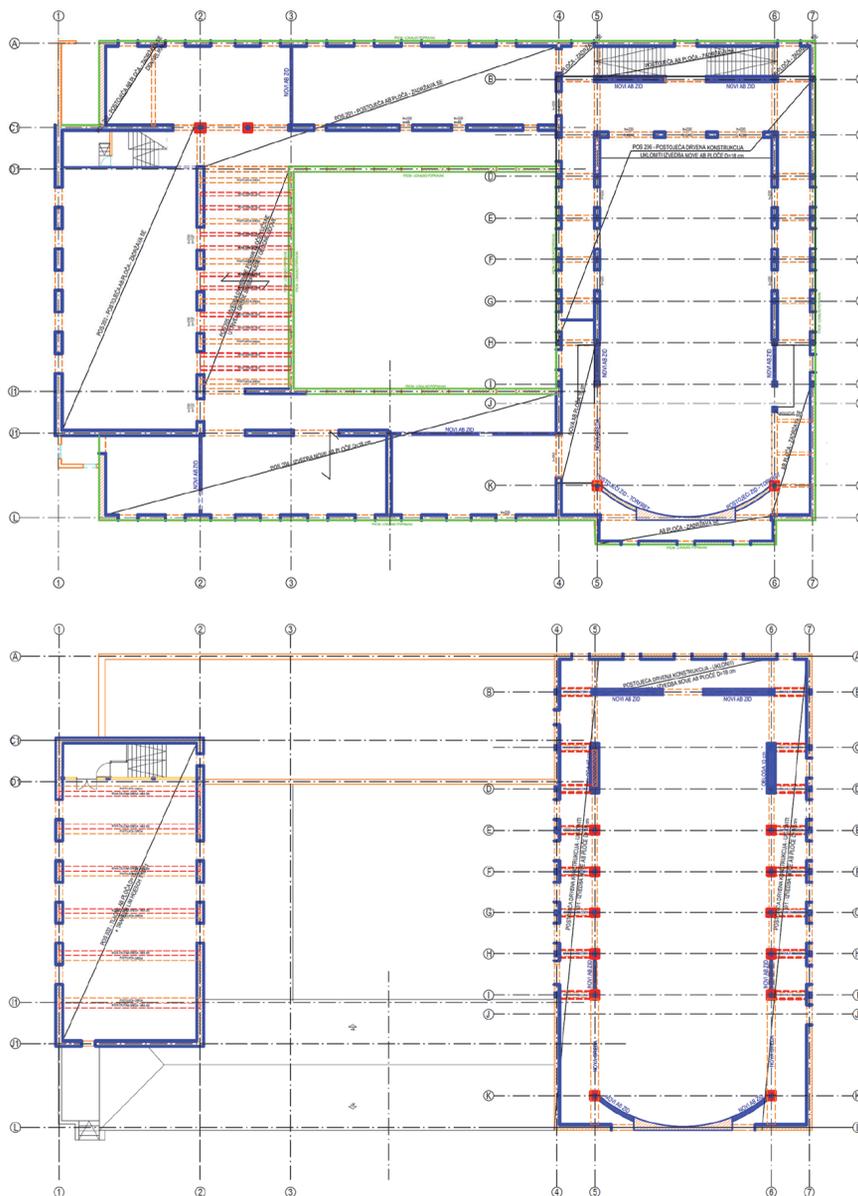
Layout of the strengthening of the ground floor and first-floor structure [11]
